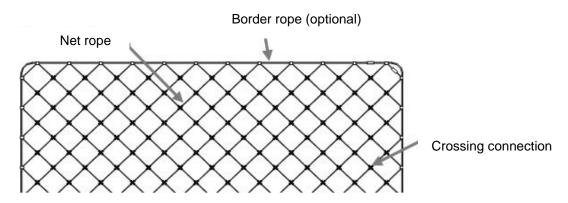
Example of steel wire rope net panel layout (with border rope)
